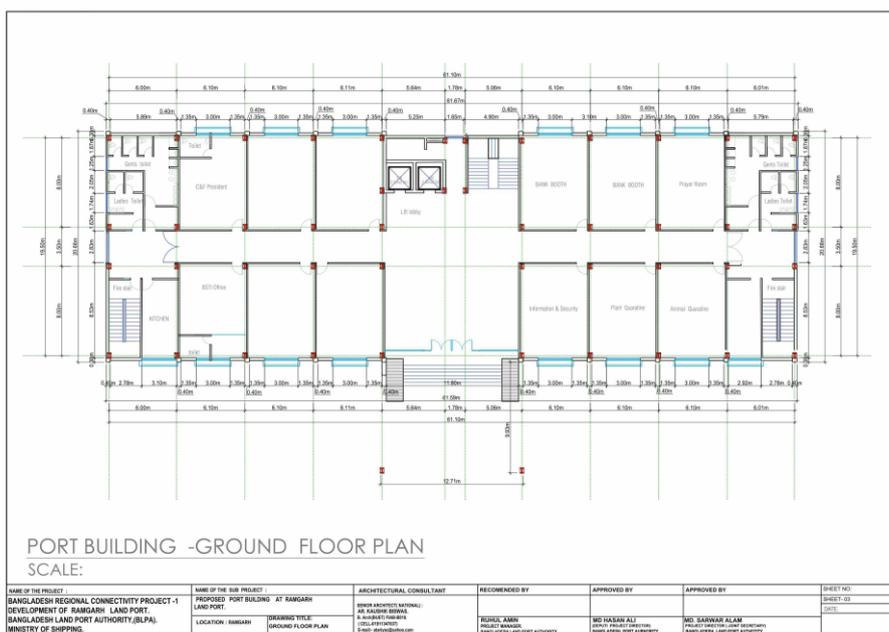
Port Building with Layout Plan of Ramgarh Land Port
